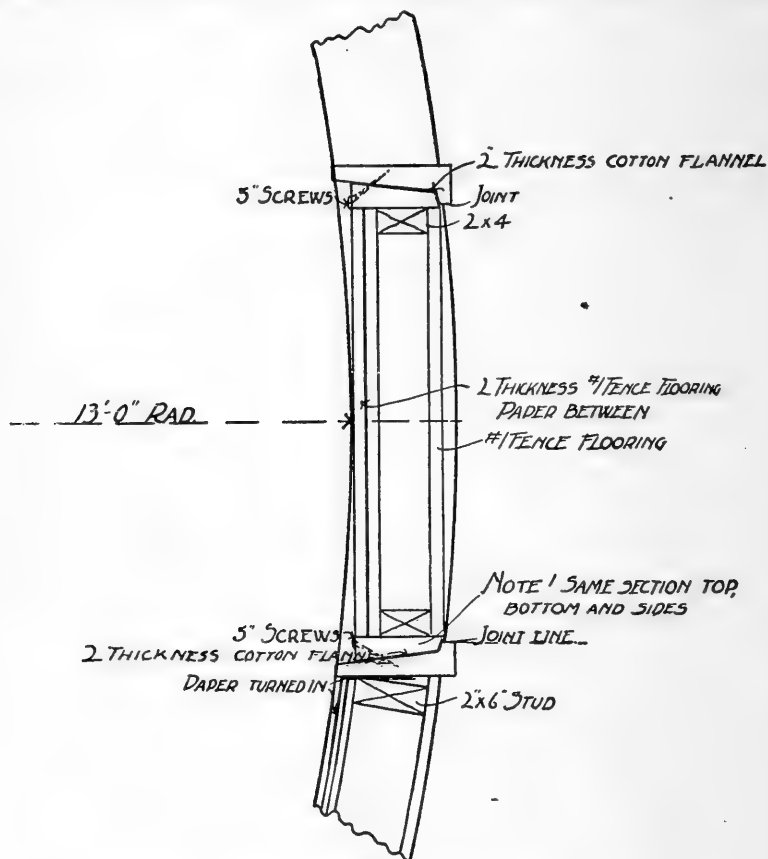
SECTION THROUGH FEED DOOR OF ROUND WOODEN SILO.
